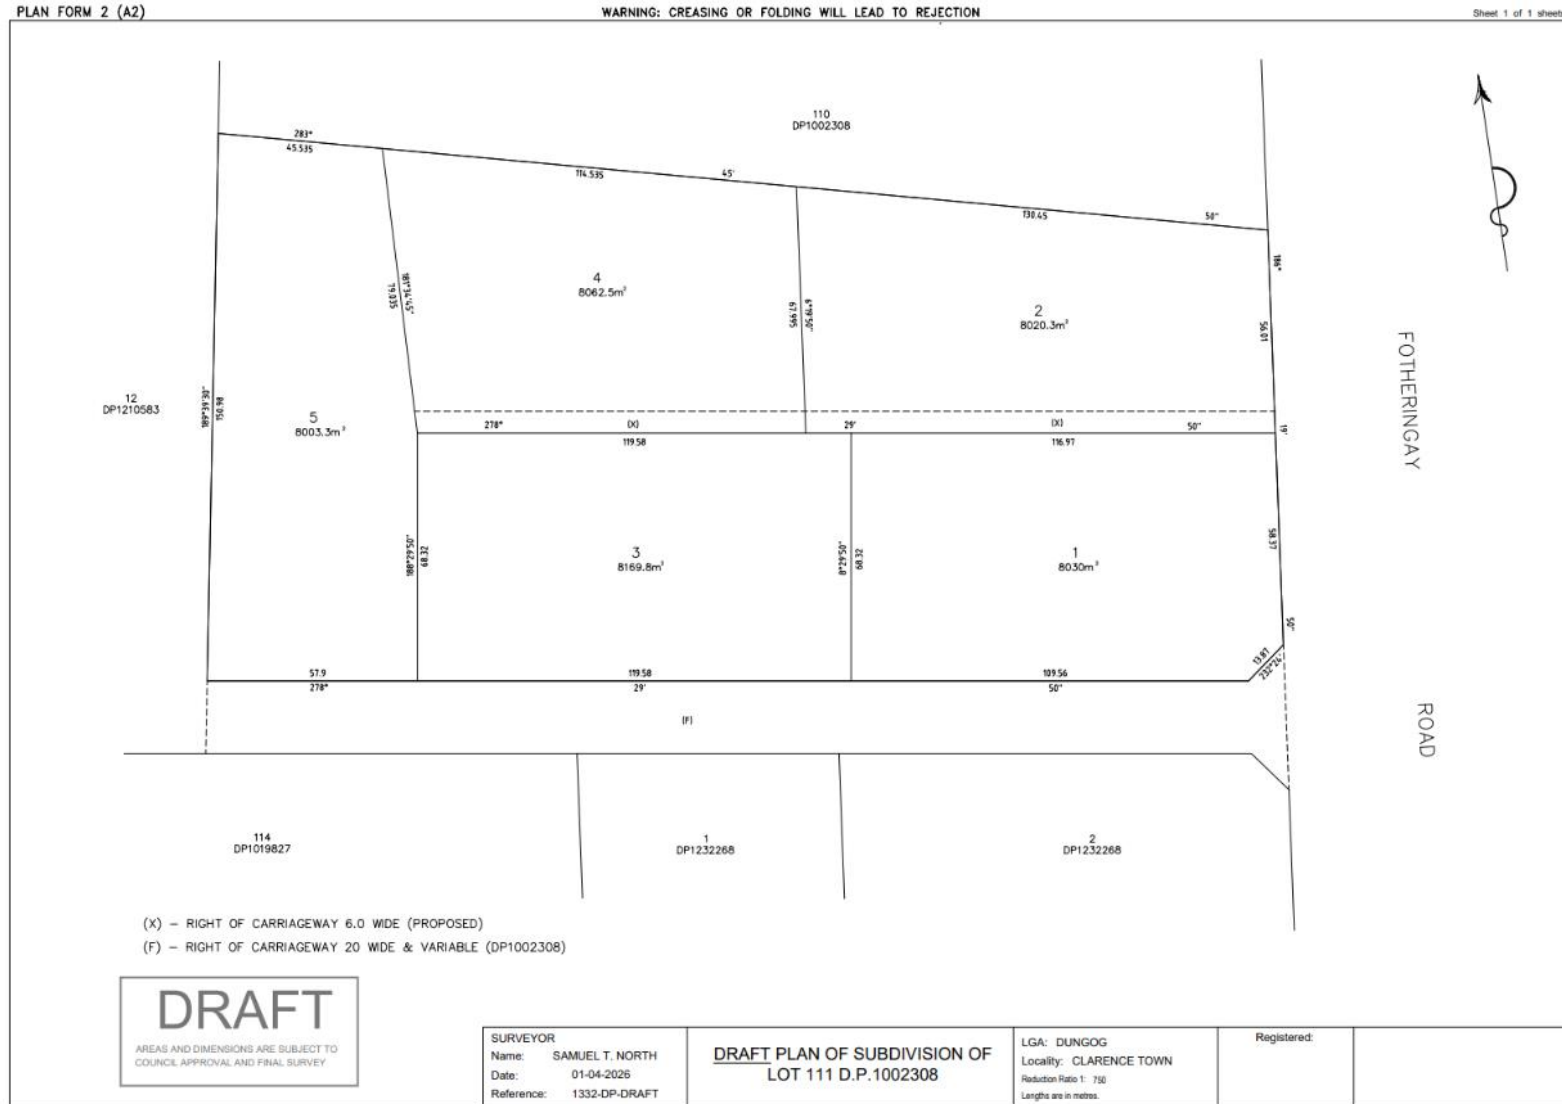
Proposed Plan of Subdivision (Source: Samuel.T.North, 2026)
